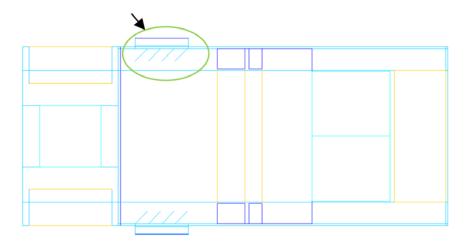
Case 2 One set of dampers point towards the cooling tower while the second set point towards the air filters
